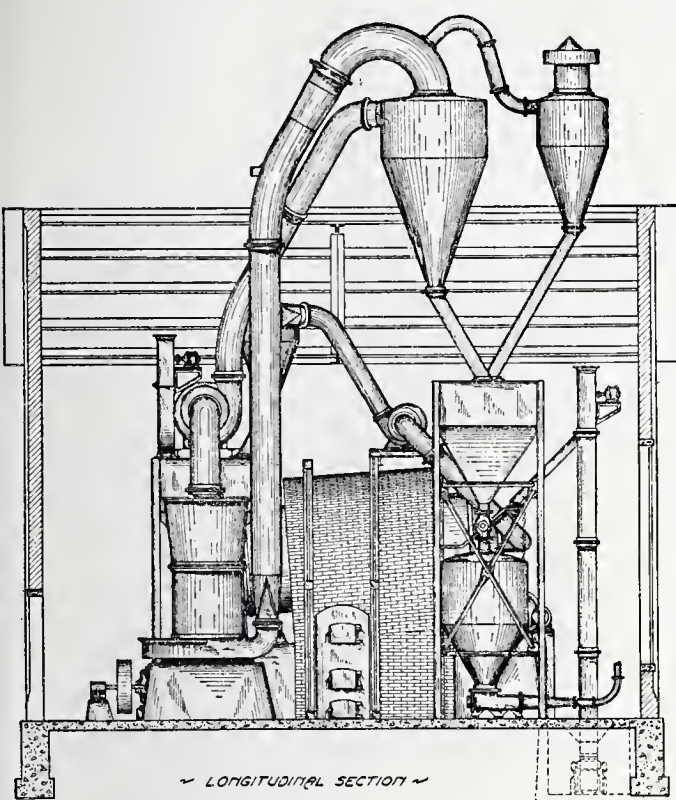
Arrangement of Small Complete Grindle Plants. (*Grindle Fuel Equipment Co.*)
